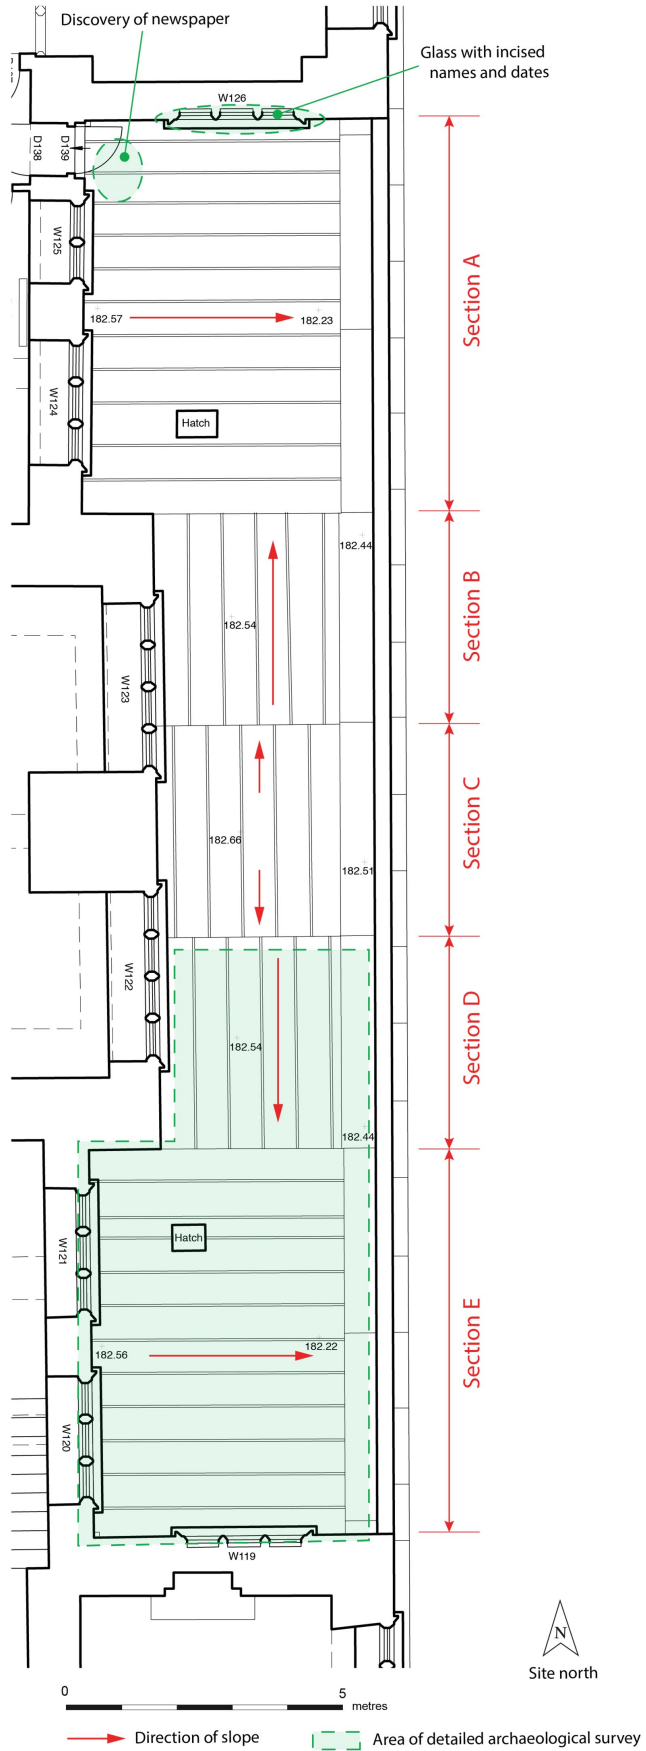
Layout of East Loggia roof (after Rodney Melville and Partners 2018)
